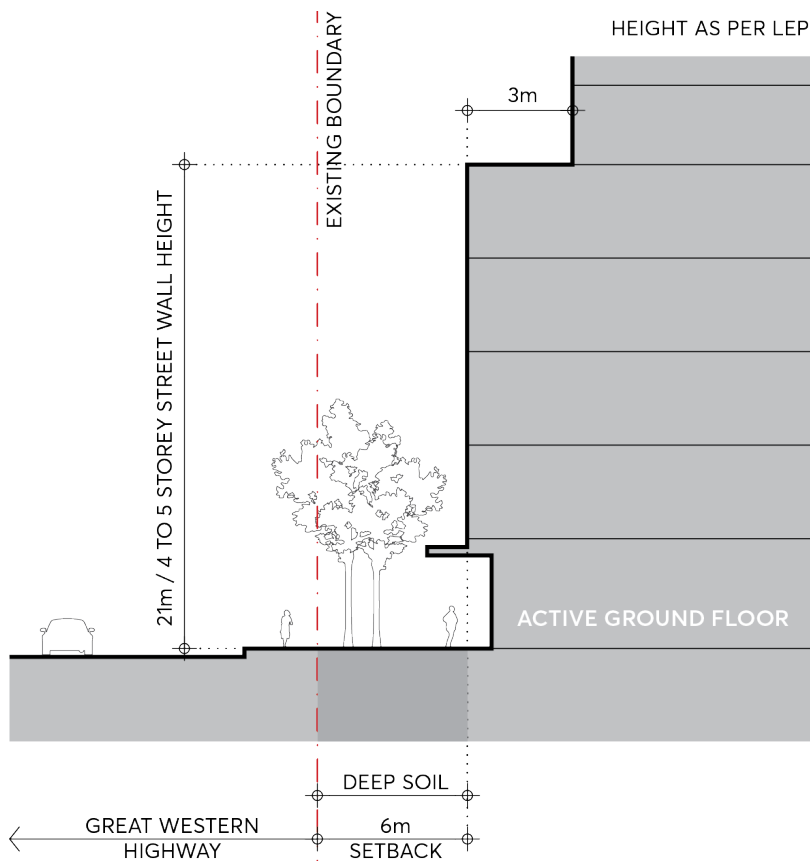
Street Setbacks to Great Western Highway
